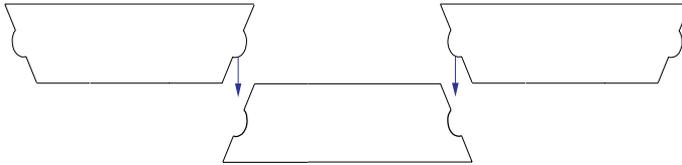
Assembly of prefabricated protective dome modules with the joining sockets [1]
